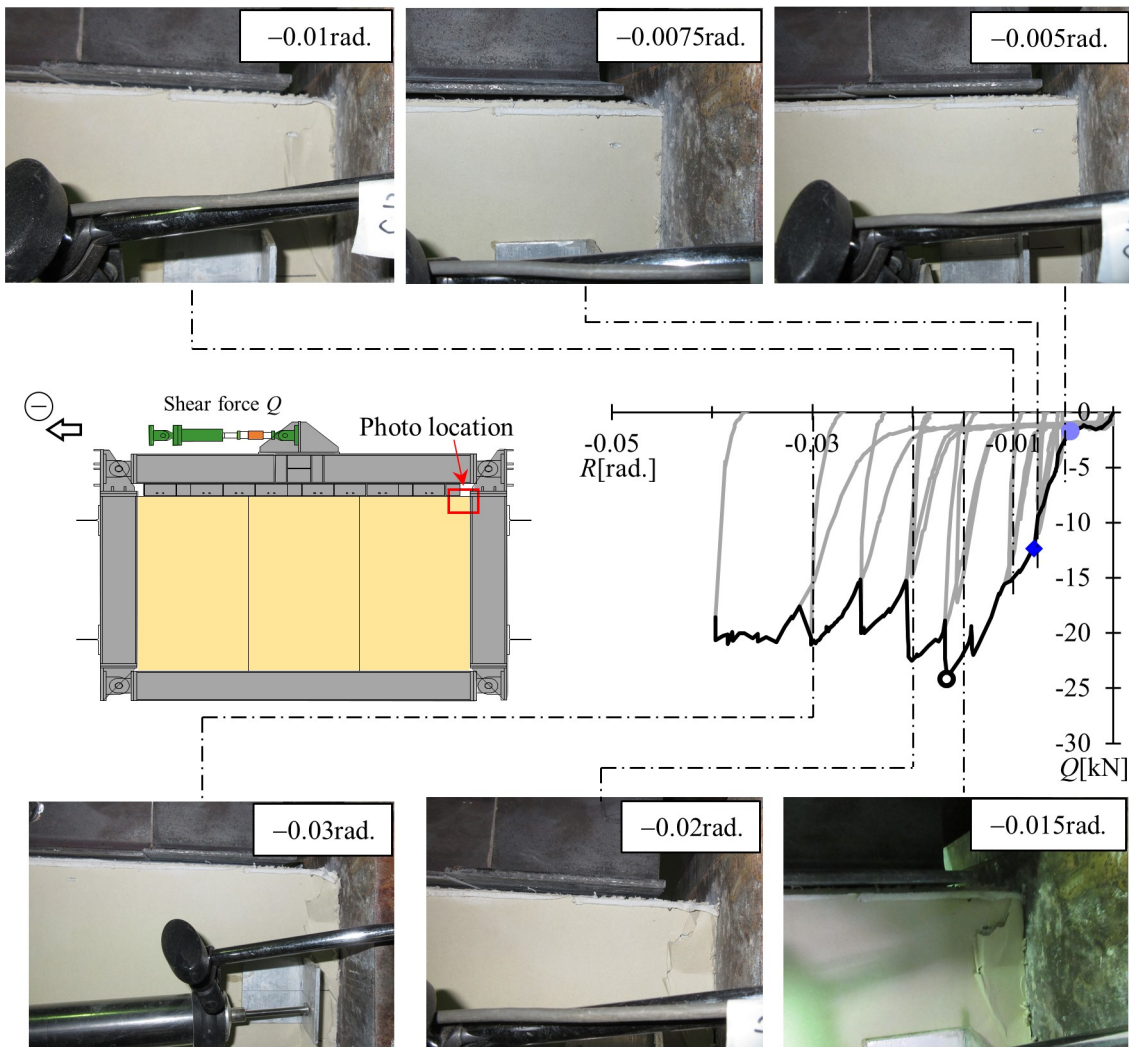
Damage to the gypsum board at loading cycle from 0.005 rad to 0.03 rad (Specimen S12.5\*2, top right corner).
